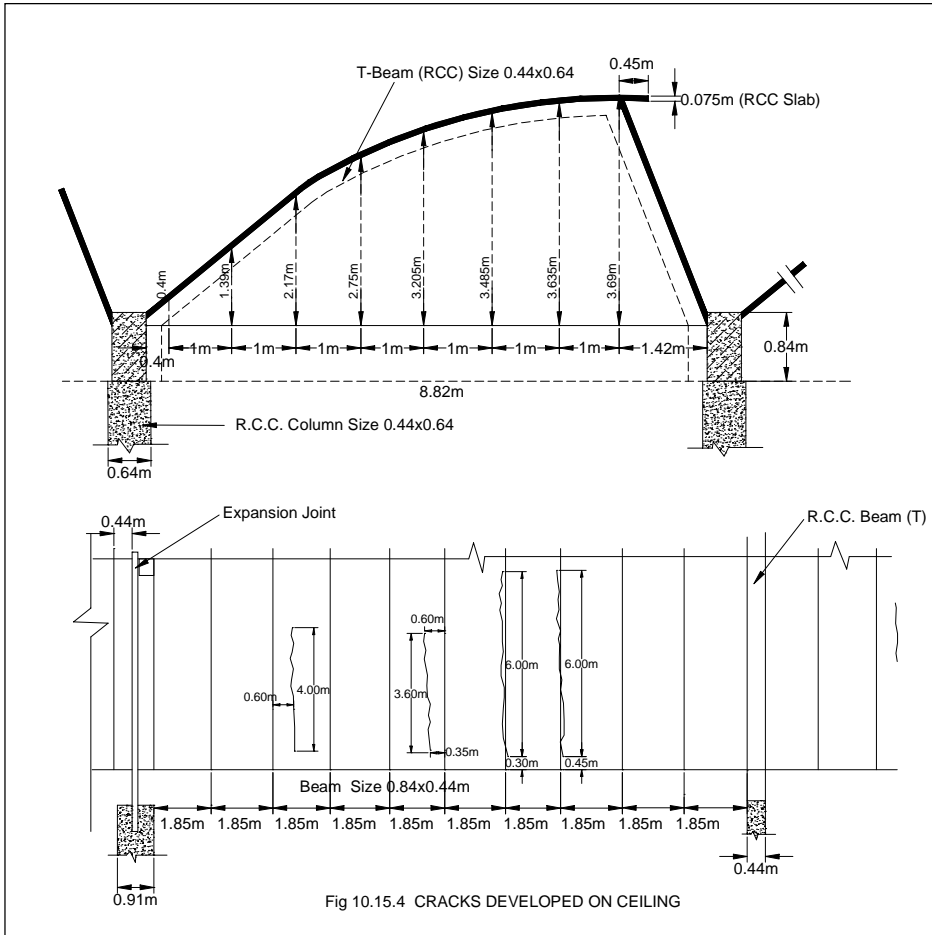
(a): Typical curved profile of shell roof as per site measurement
